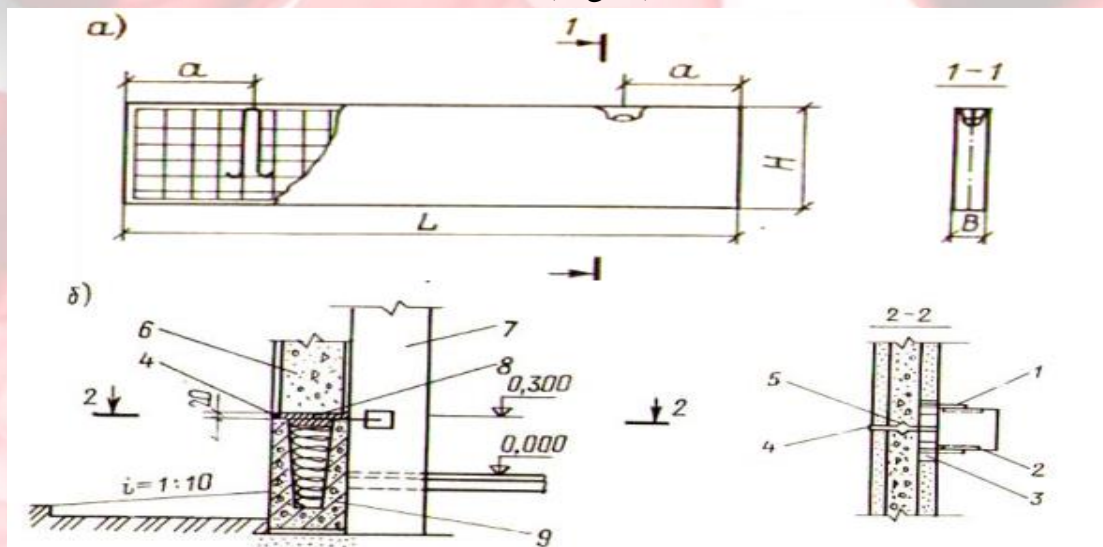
Single-layer arbolite wall panel. general view of a-panel; Installation of b-panel on the foundation block; 1-diameter 12 mm, class A-1 steel rod; Welding detail of the 2nd column; 3-base block welding detail; 4th mastic; 5-grade 50 cement-sand mixture; 6-arbolite wall panel; column 7; 8th layer of moisture protection
